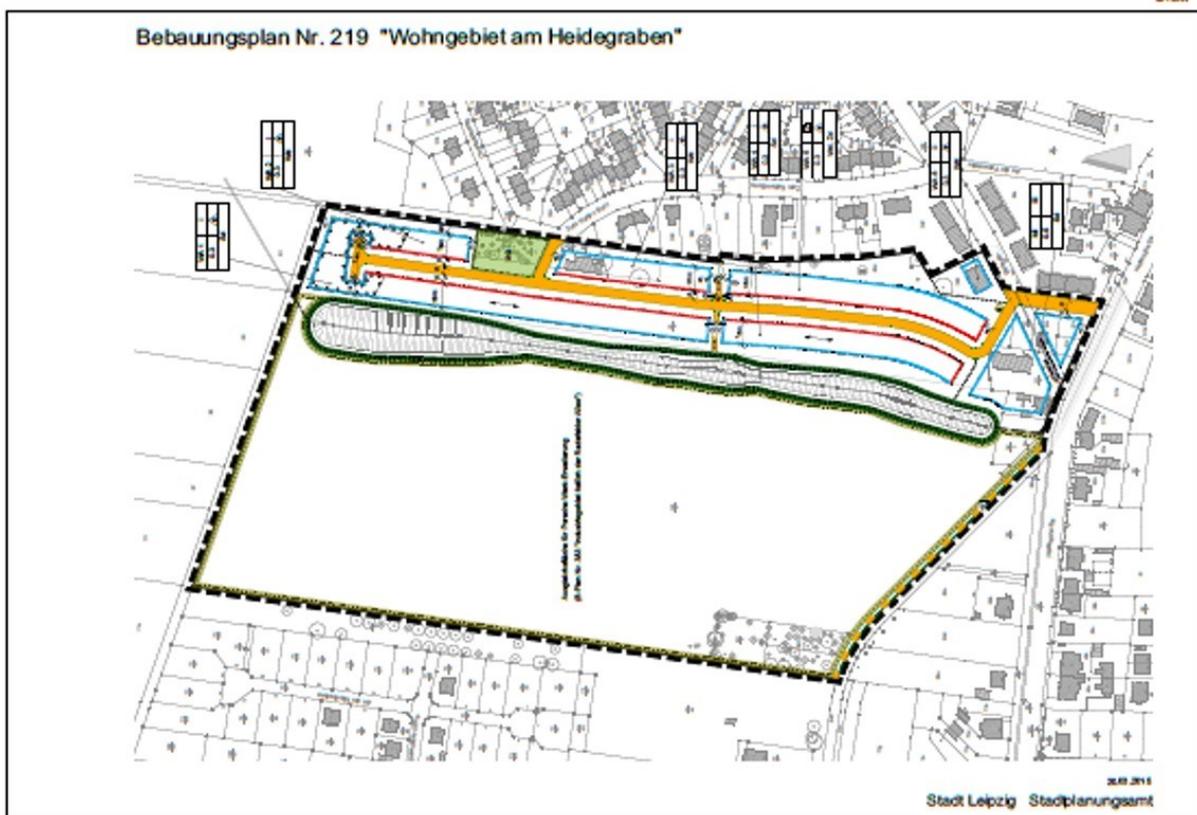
Plan layout for B-Plan 219 (Stadt Leipzig, 2015e)
